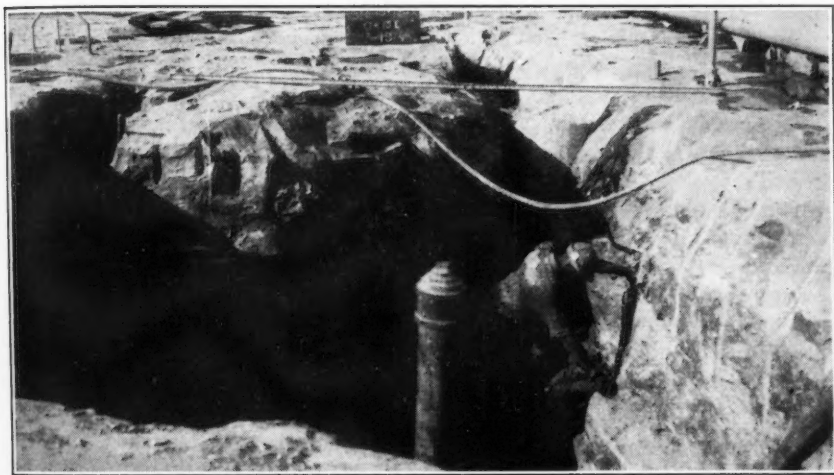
VERTICAL SOLUTION SEAMS UNDER INTAKE AND POWER HOUSE, CLEANED AND NEARLY READY FOR CONCRETE FILLING
